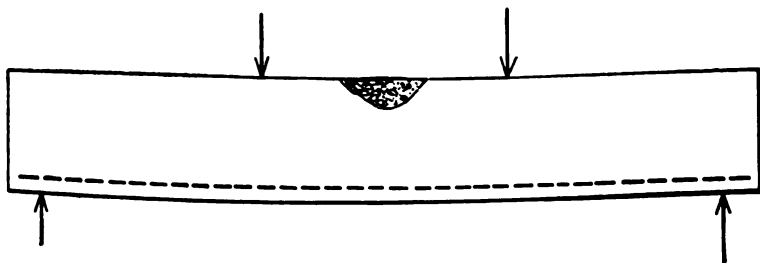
Beam Failure by Compression in Concrete.
